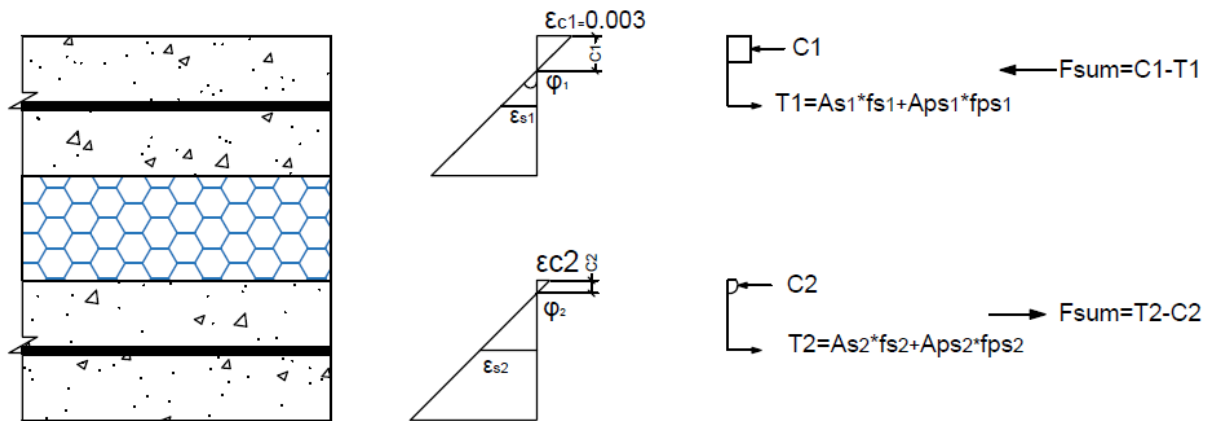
Strain and load profile of concrete sandwich wall panel
